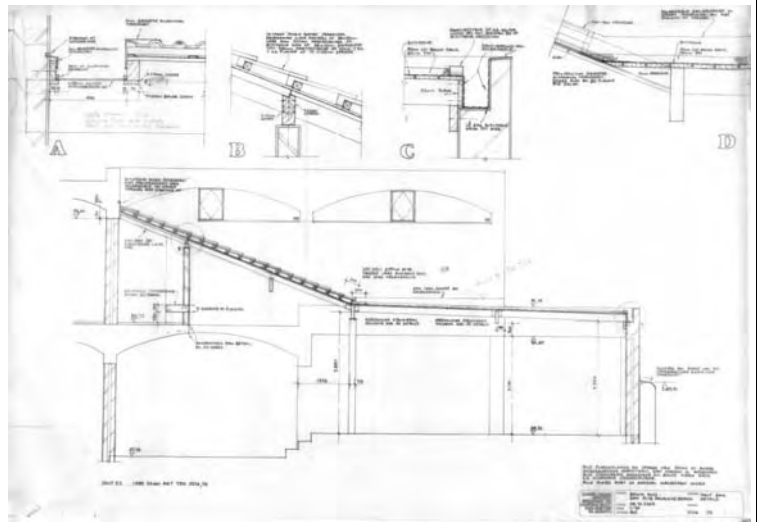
0206-03. Pencil On Tracing.
